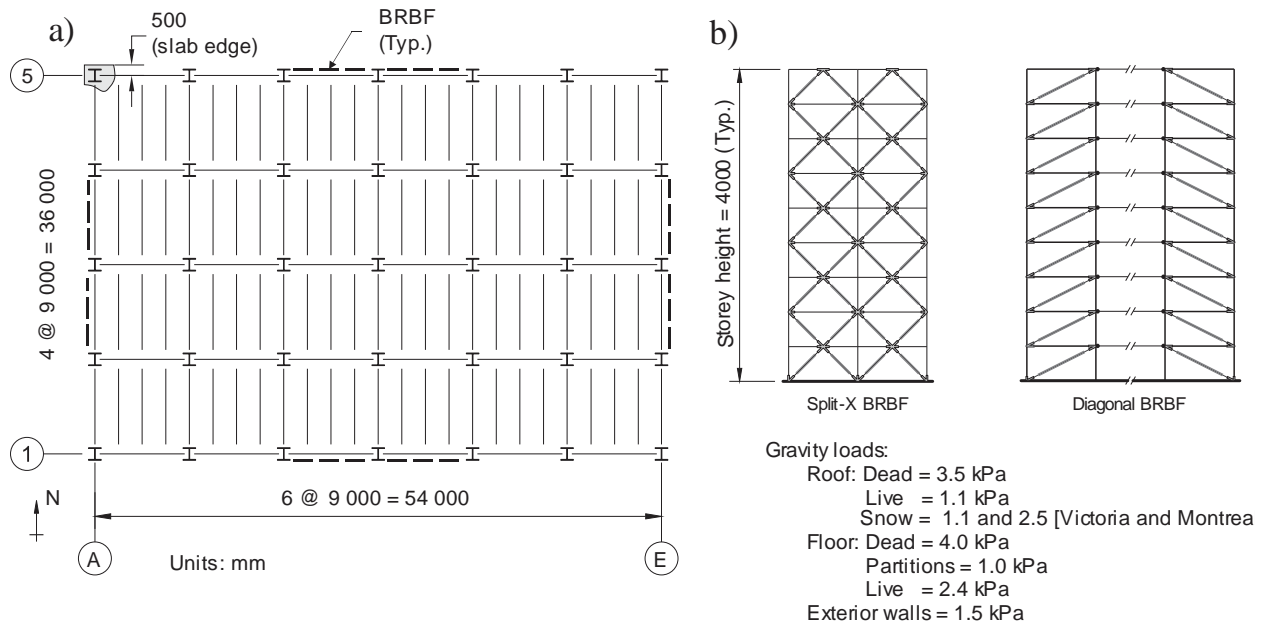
a) Plan of the studied building prototype (back-to-back brace bay arrangement is shown); b) Elevation view of the braced bays (only system with “back-to-back Split-X” chevron and “separated diagonal” braced panels are shown).
